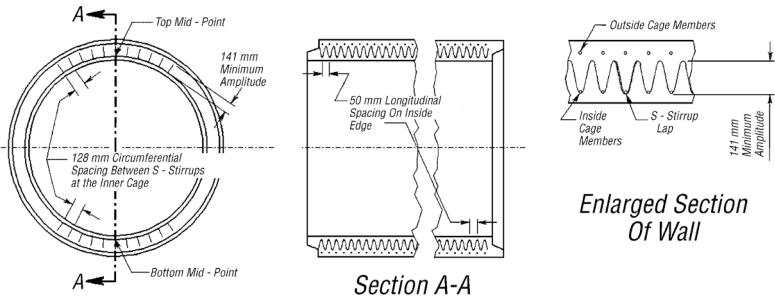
M Illustrative Example of S-Stirrup Support System for 0.3 mm Crack D-Load 140.0, 2550 mm diameter Pipe Minimum Area per Support 34 mm², 11 Lines Spaced @ 128 mm. For other classes and sizes, see Tables 706.02-2M, 3M, and 4M.
